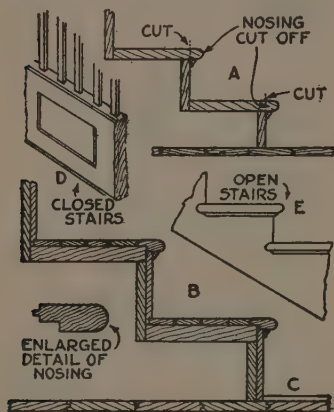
Steps in overlaying worn stairs with $\frac{1}{2}$ in. thick wood.
